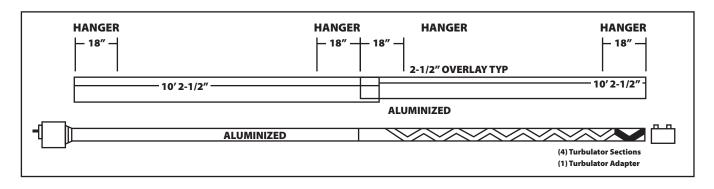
Ener-Radiant XL Model ERXL-80, Assembly Overview
